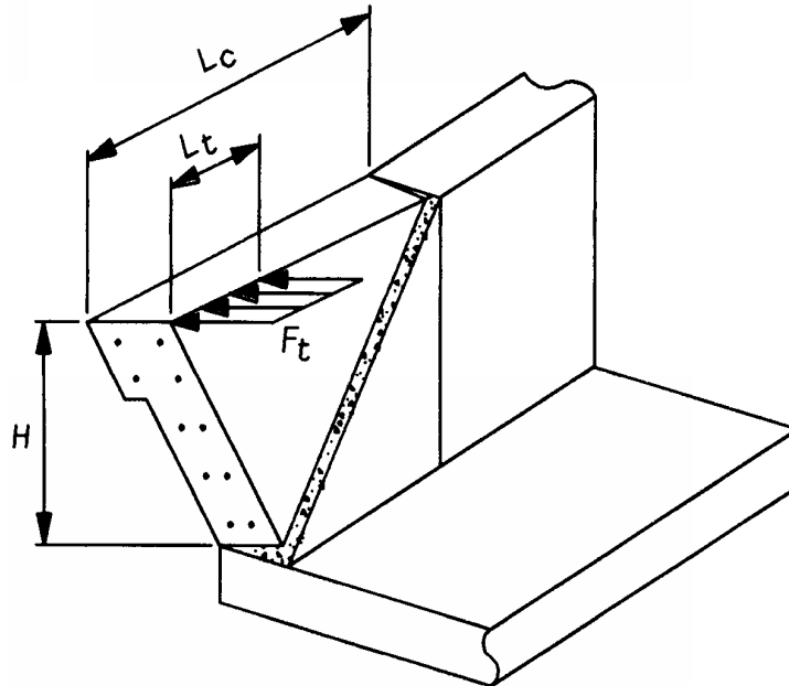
Yield Line Analysis of Concrete Parapet Walls for Impact near End of Wall Segment
